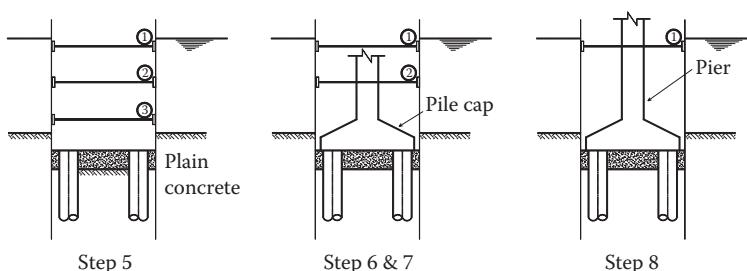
Steps 5, 6, 7, and 8 of construction stages.
